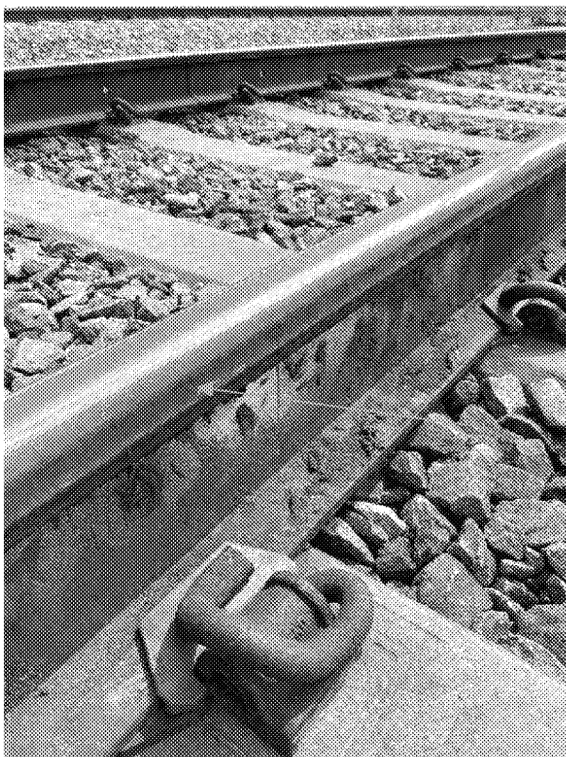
Transposed Rail with Excessive Side Wear Now Moved to the Outside Edge
